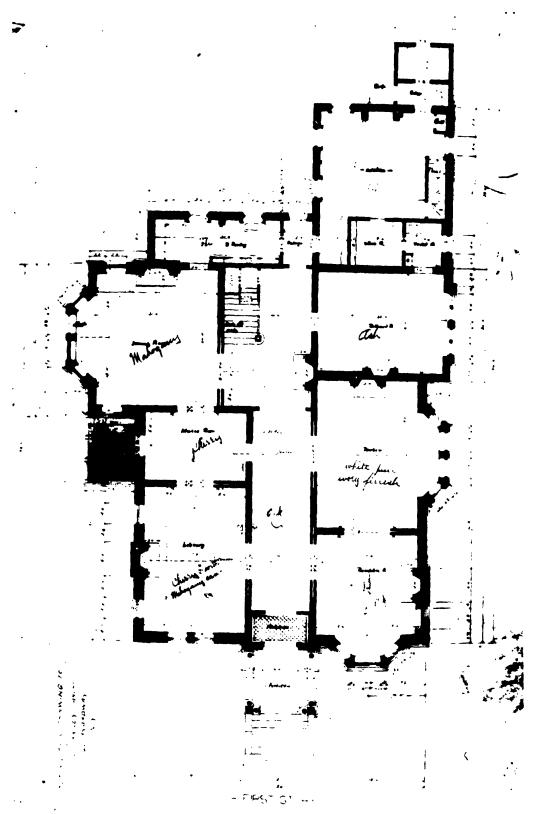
Plate II. ARCHITECT'S PLAN OF THE "FIRST STORY" OF THE BALLANTINE HOUSE. G. E. Harney, 149 Broadway, New York. (Note pencil additions)
